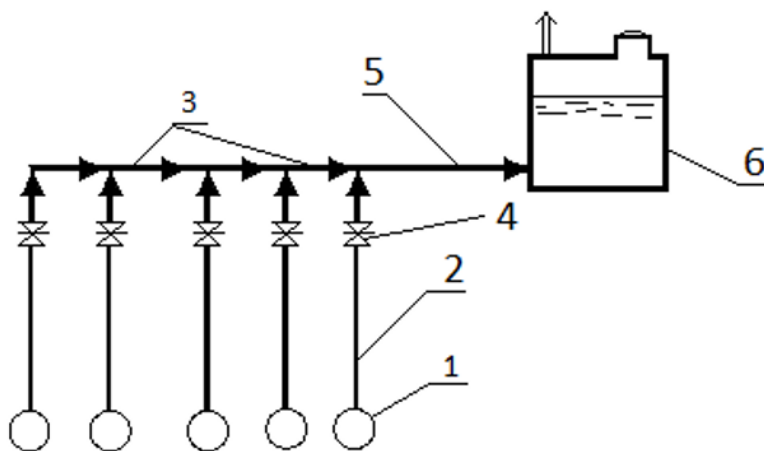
Linear scheme of wells connection on water diversion work from underground spring
